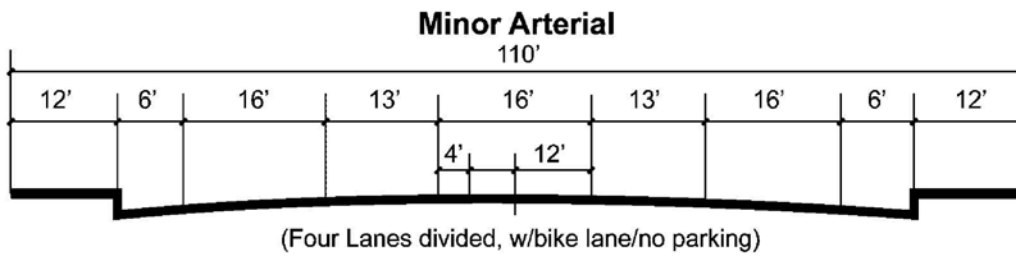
CITY OF RANCHO MIRAGE GENERAL PLAN ROADWAY CROSS-SECTIONS
